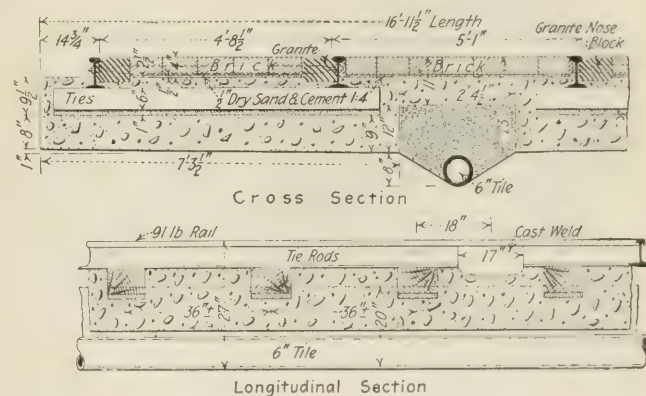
STANDARD TRACK CONSTRUCTION FOR PAVED STREETS; DETROIT UNITED RY.
